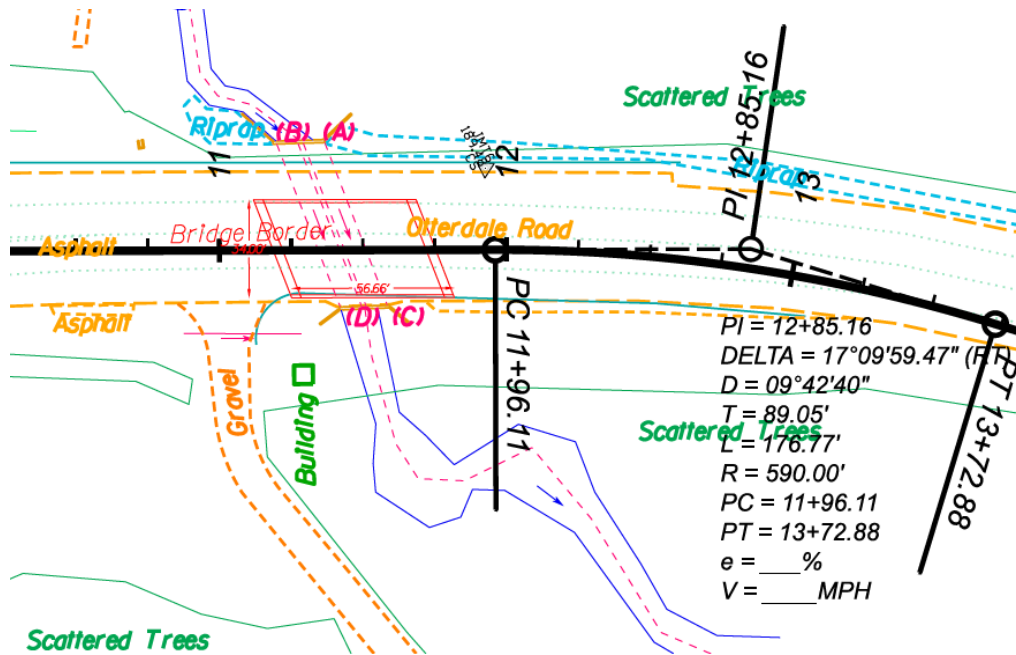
Final Bridge Placement Relative to New Roadway Centerline in OpenRoads
